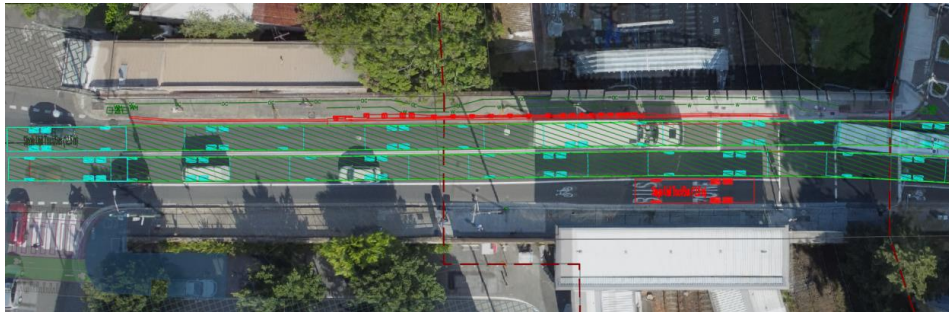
Turn paths on existing road configuration for buses travelling north-south direction on Illawarra Road over the railway bridge.
